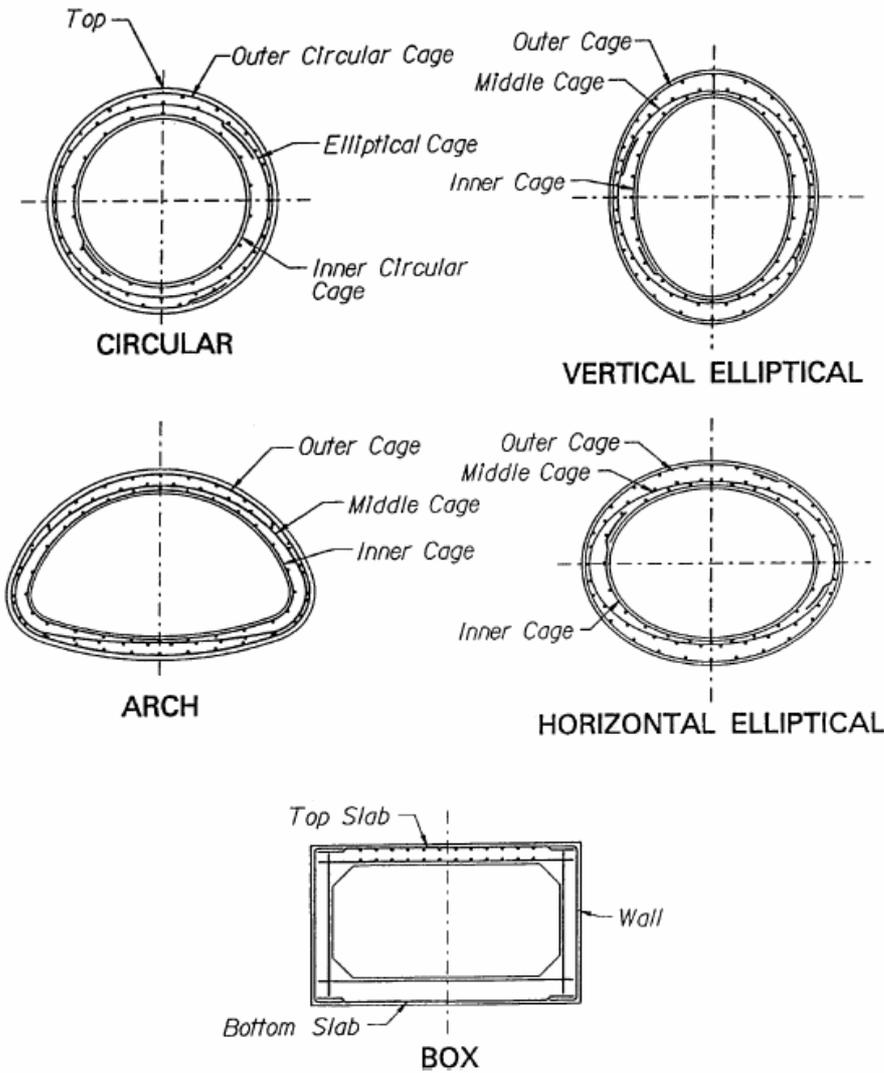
Precast culvert sections (US Army Corps of Engineers, 1997)
